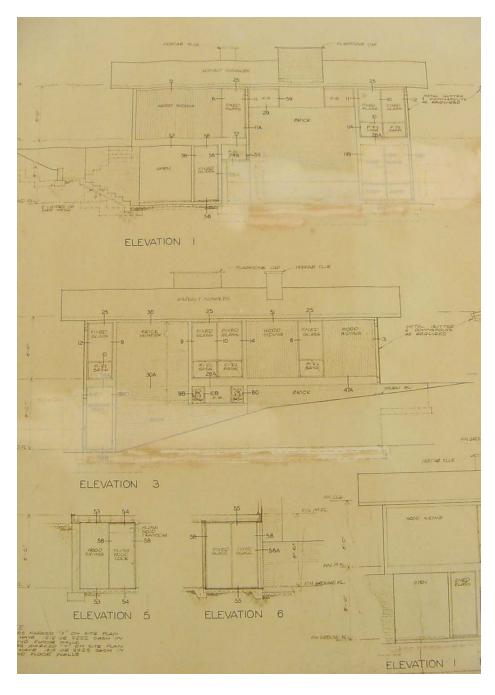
Elevations, Crest Park, Unit BC-2U-2
